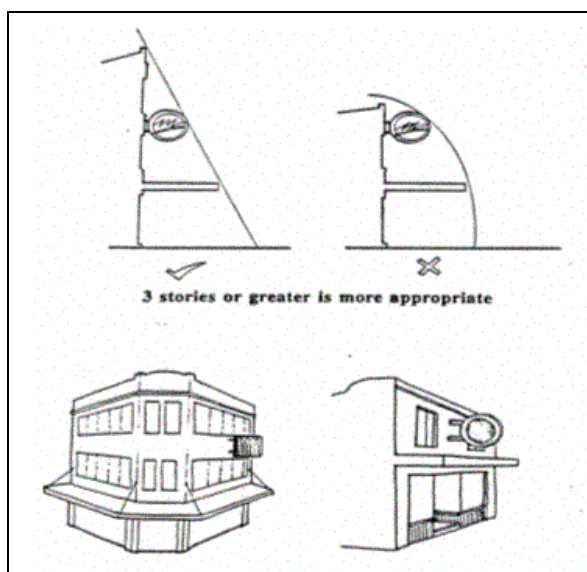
Three storeys or greater is more appropriate for projecting wall signs.
